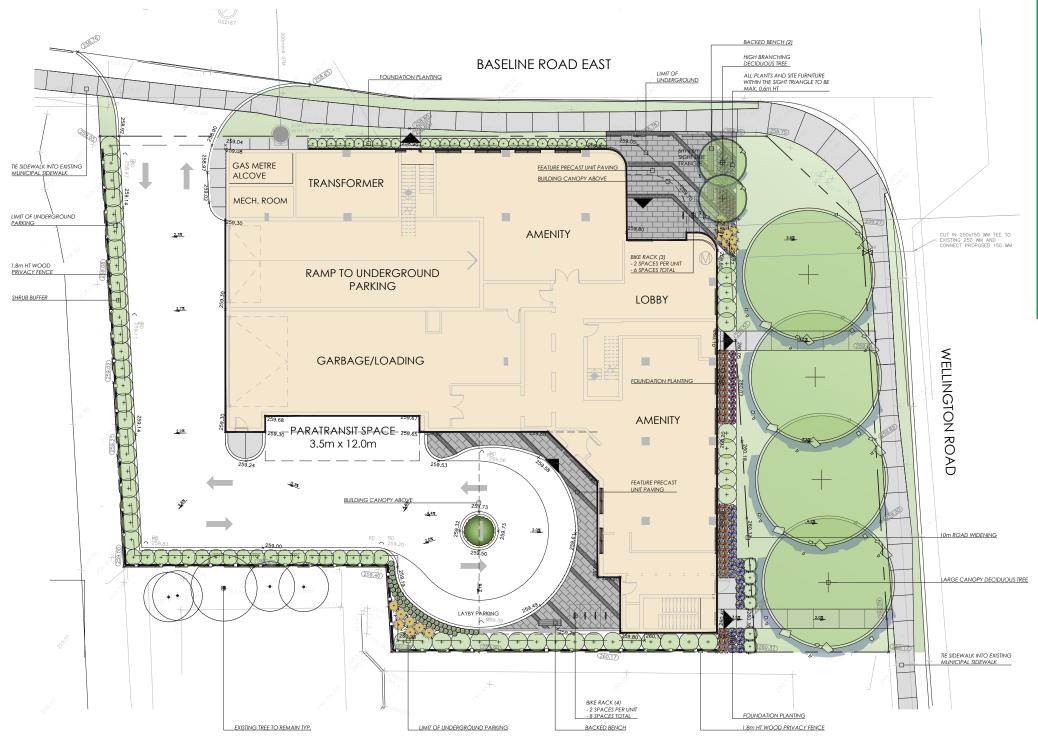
Landscape Concept Plan prepared by Adesso Design Inc.
